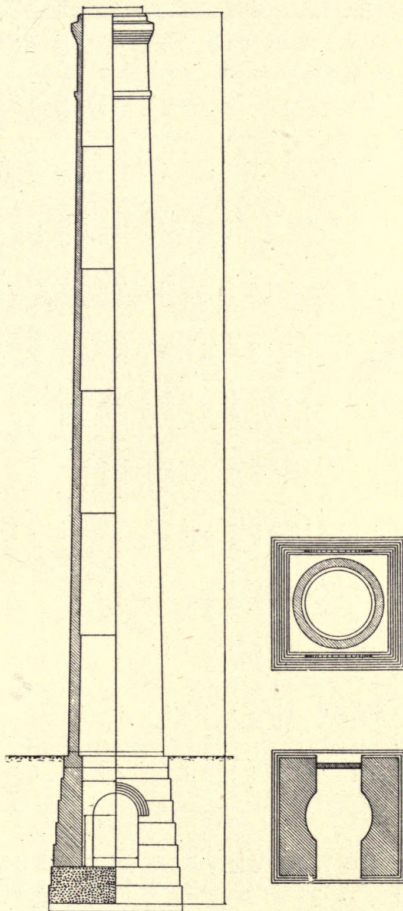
Elevation and Section of Chimney with Arched Opening in Foundation for Connecting Under-ground Flue.
